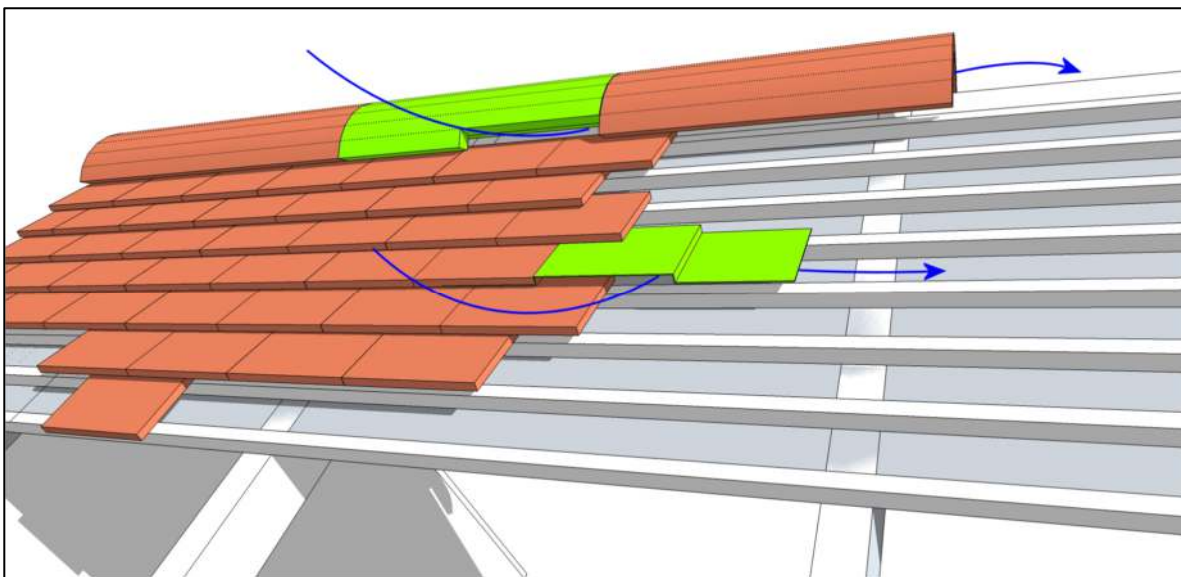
Access to the tile/lining cavity via a modified ridge tile and a lead saddle
